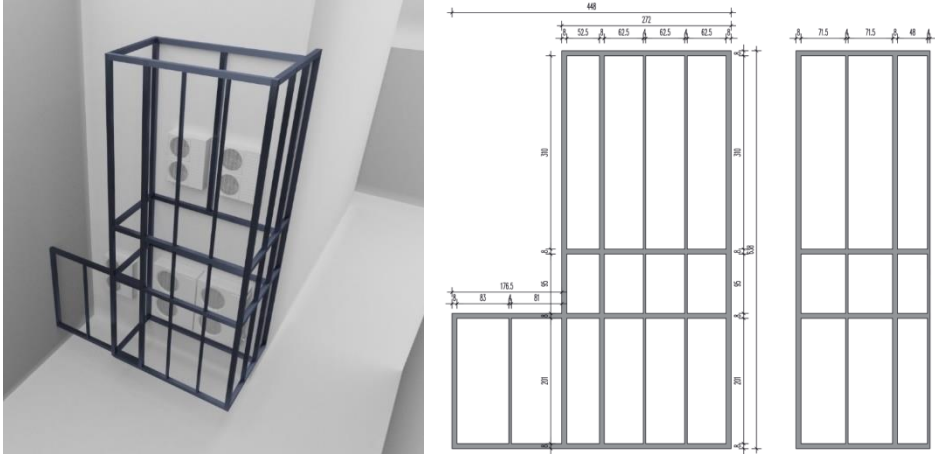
Appearance of the steel structure of the designed barrier (left) and dimensions of the steel structure (right)
